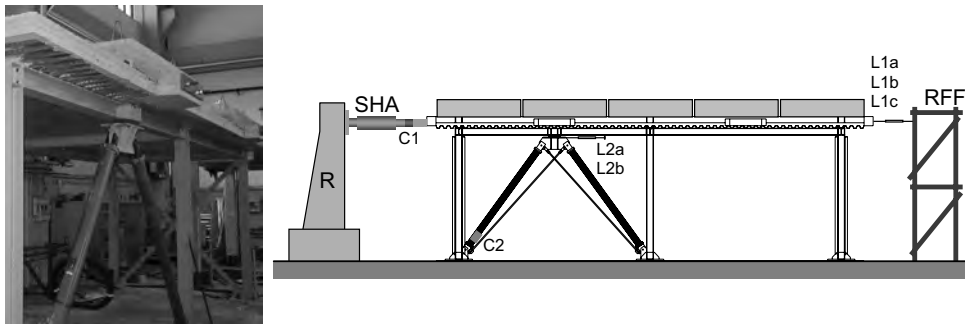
Steel-concrete composite space frame equipped with HDR dissipating braces.
